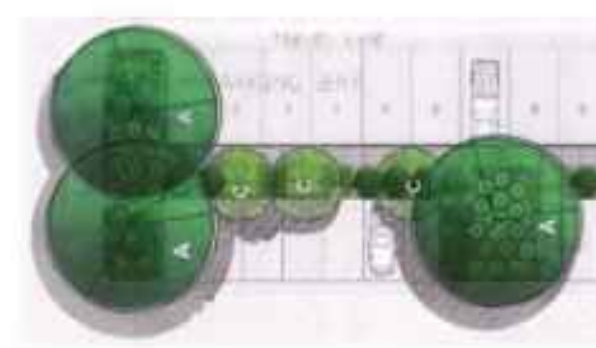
Example of Parking Lot Planter Areas.
